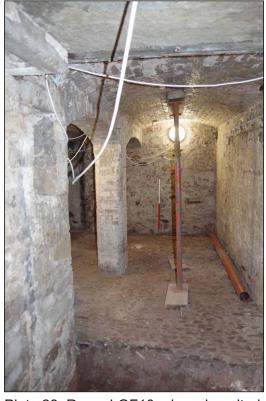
Room LGF10 – barrel-vaulted cellar, looking east. 1m scale
